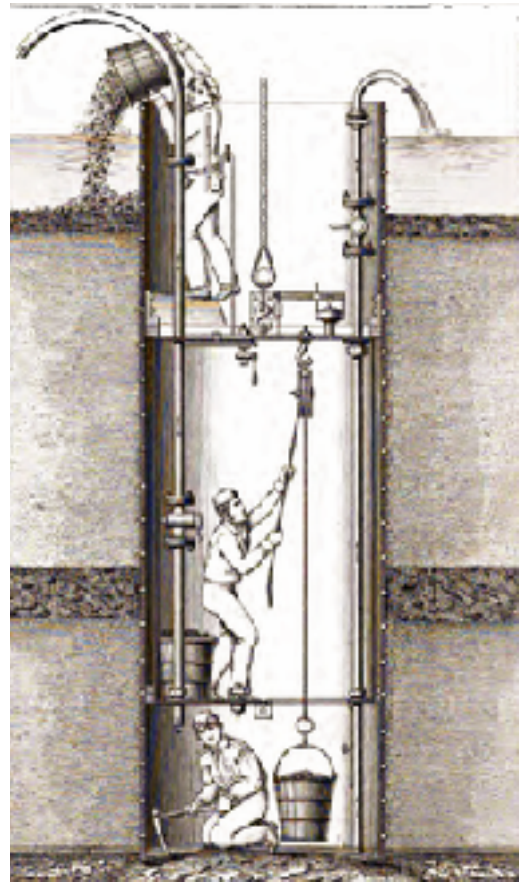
Caissons constructed for the Pyrmont Bridge, NSW. Figure 3. Caisson; devised 1846, Jules Triger
